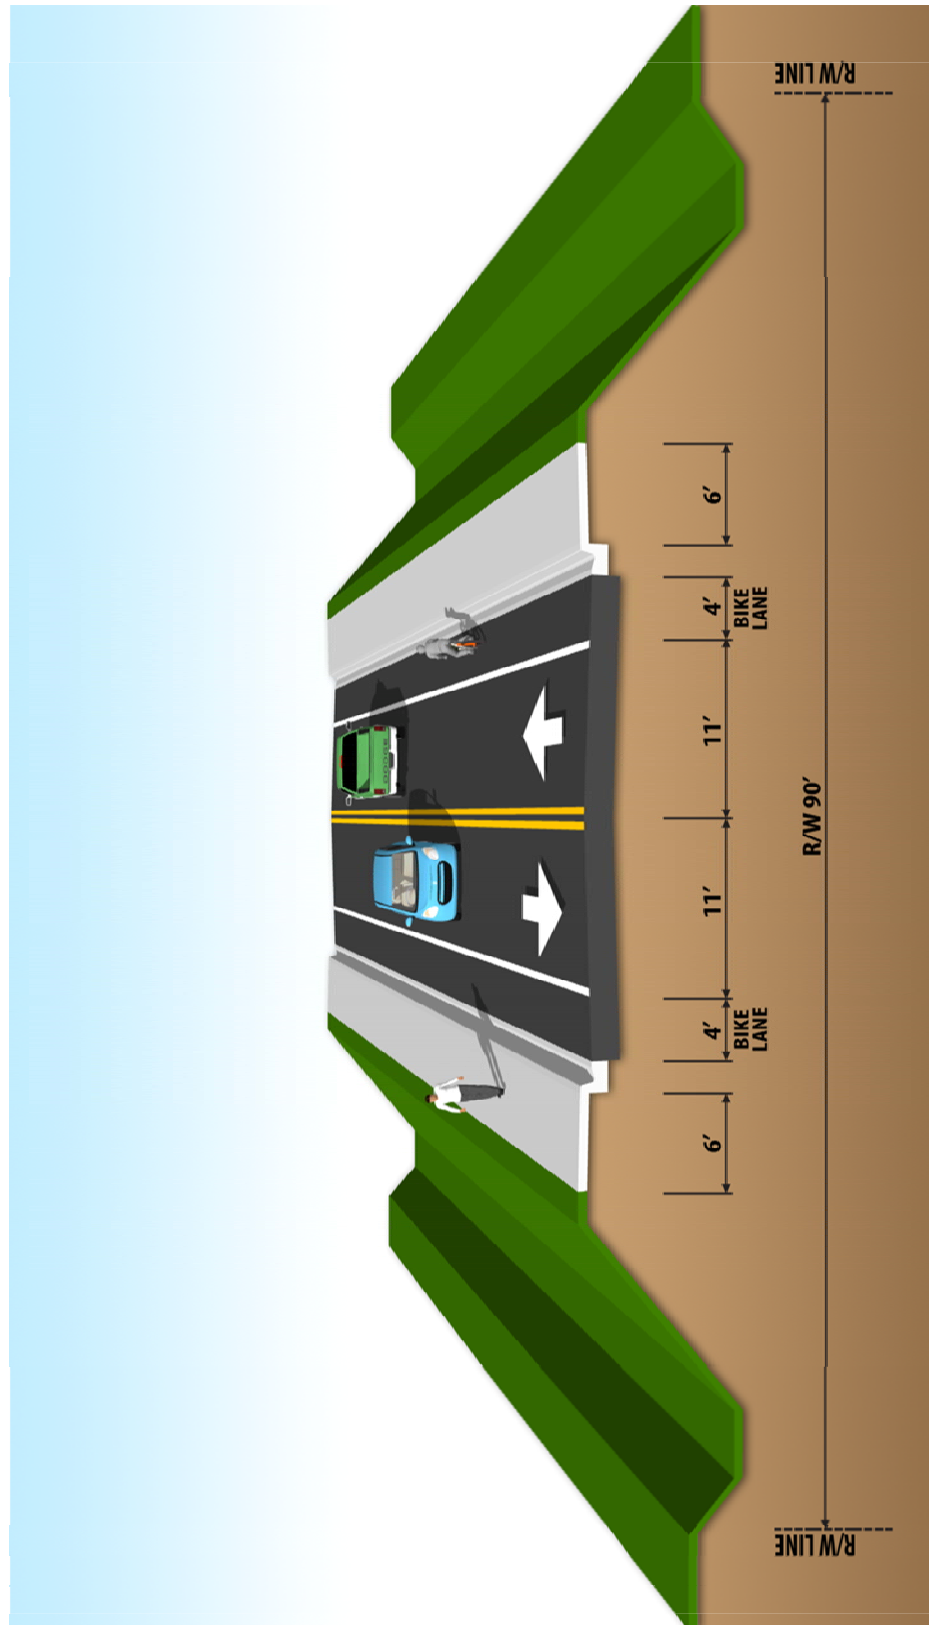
Proposed JNCAR Rural Typical Section
